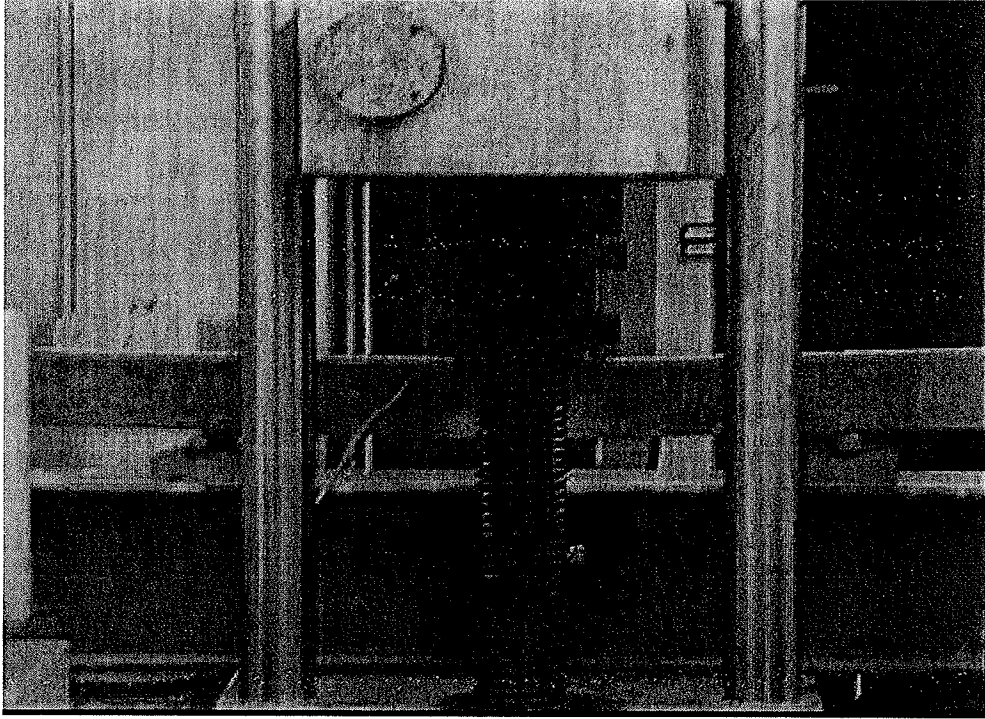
BRC-4 beam, at failure. The beam failed purely in flexure.
